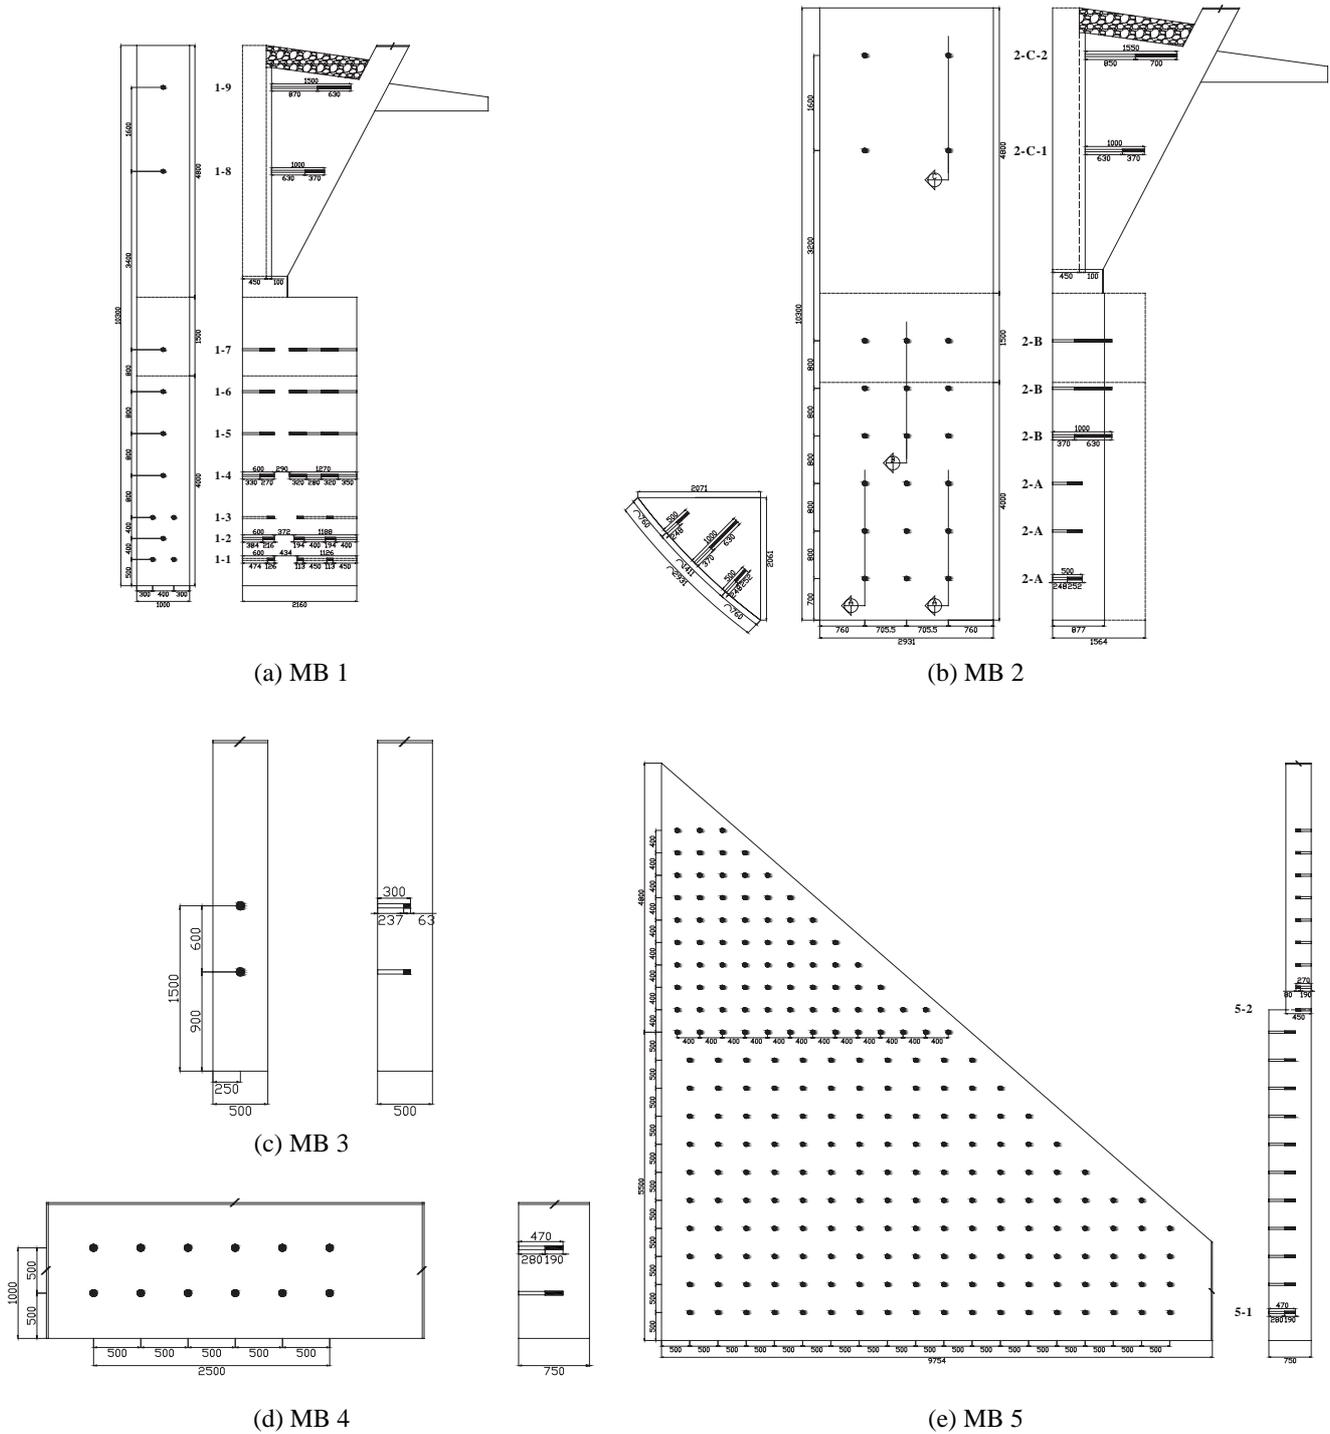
Pattern diagram of holes and the explosive for the main blasting (unit : mm).
